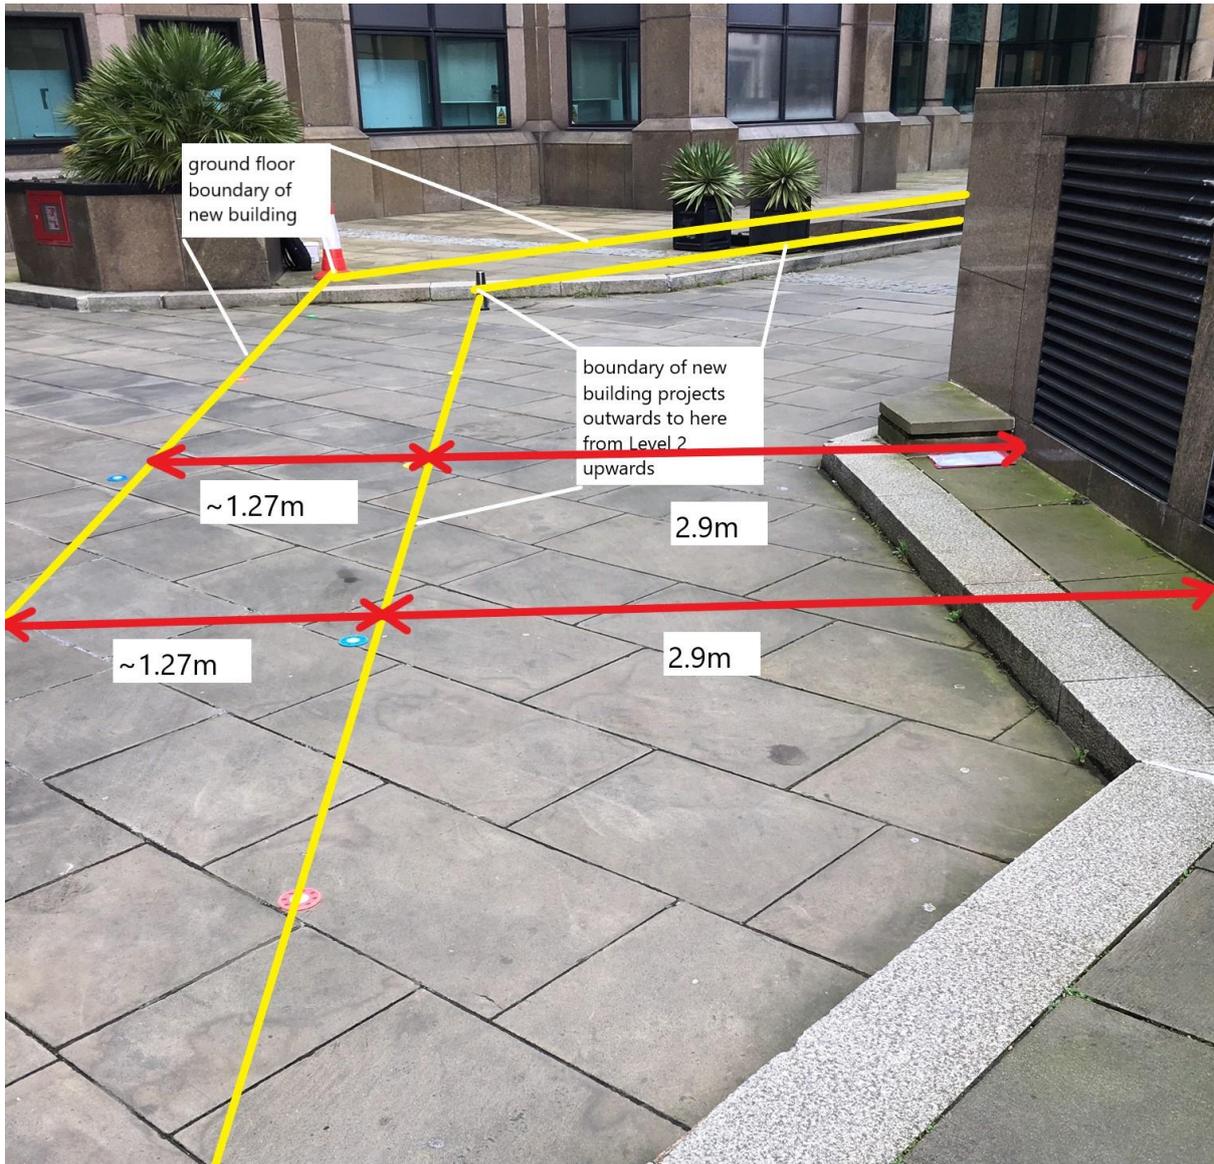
Yellow lines show new MBH building boundary; these are too close to the Podium on right and make the vehicular turning area impossible to use, in breach of CoL Highways regulations
